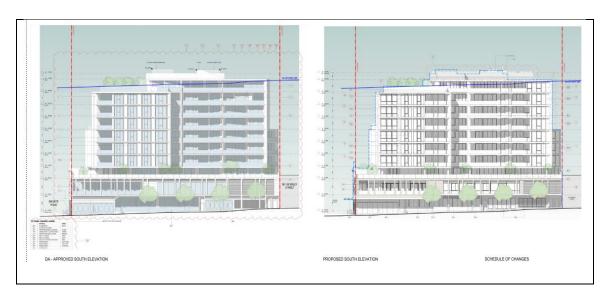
Comparison south elevation showing modification to approved plant area as viewed from Ebley Street frontage (previous approval scheme on left, proposed scheme on right)
